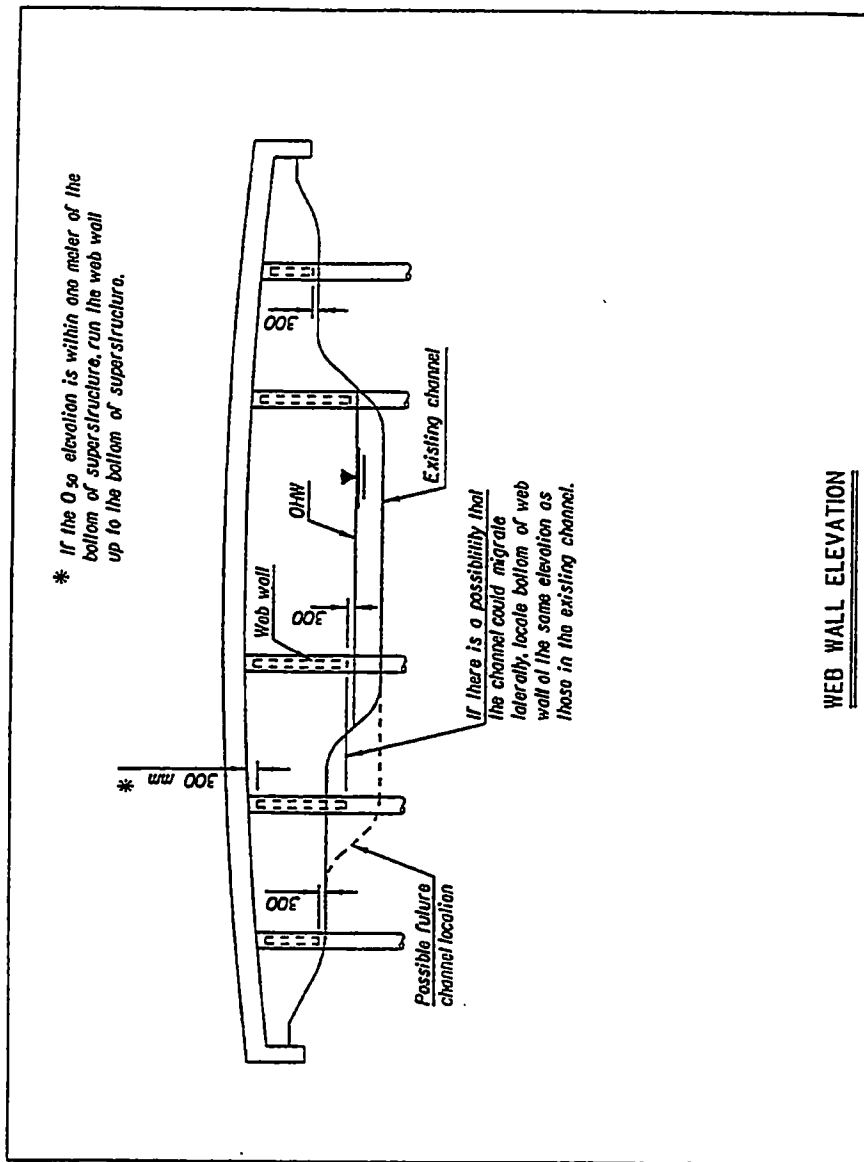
Web Wall Elevation,(from Kansas Department of Transportation, 1999)
